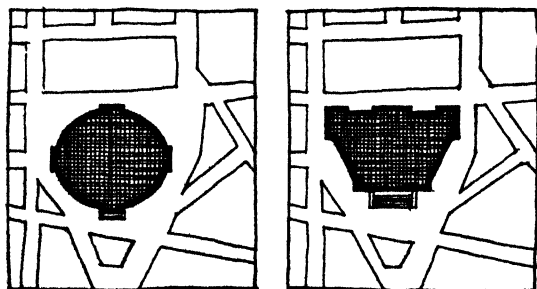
BLOCK PLANS OF TWO COMPETITION DESIGNS FOR NEW YORK COURT HOUSE
